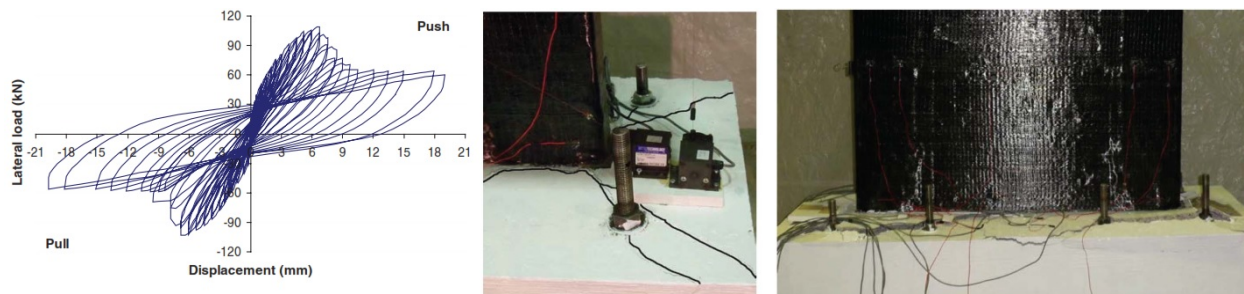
Lateral Load-top Displacement, Local Cracking of Footing at the Maximum Load and Failure of RW1 (El-Sokkary and Galal, 2013)
